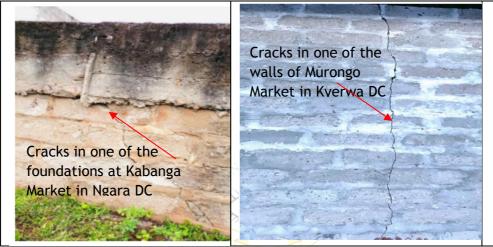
Cracks on the Constructed walls in Kabanga Market in Ngara DC and Murongo Market in Kyerwa DC, taken by the MoFP Review Team in June, 2021
